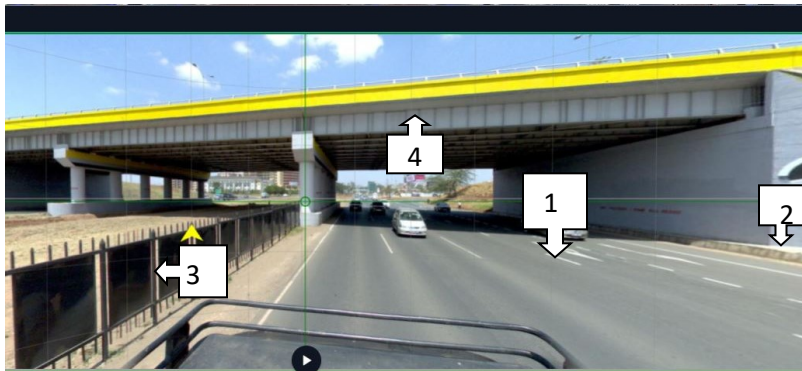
Mombasa Road Interchange showing the 1 road Markings, 2 Kerb, 3 Barrier as well as 4 bridge columns (Source: Authors data)
